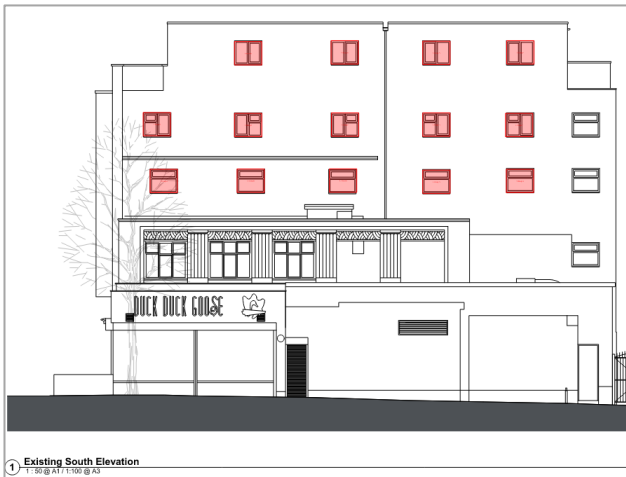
South Elevation of 240 Kilburn High Road. Windows being removed are highlighted in red.
